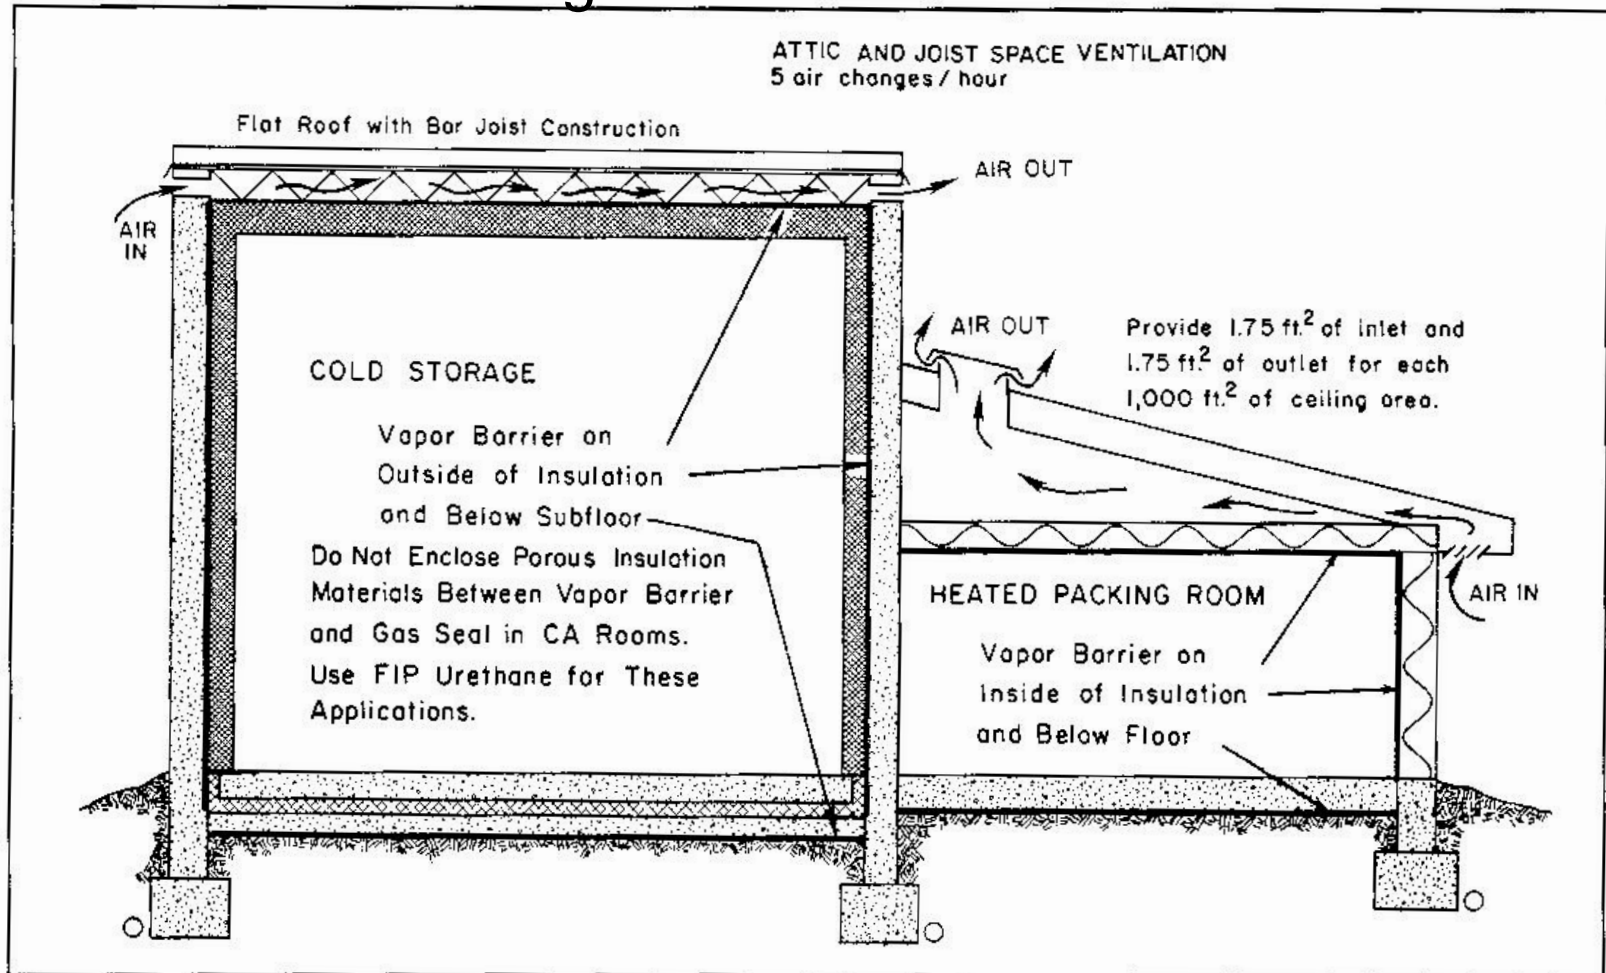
Vapor Barrier Location and Methods of Ventilating Attics
